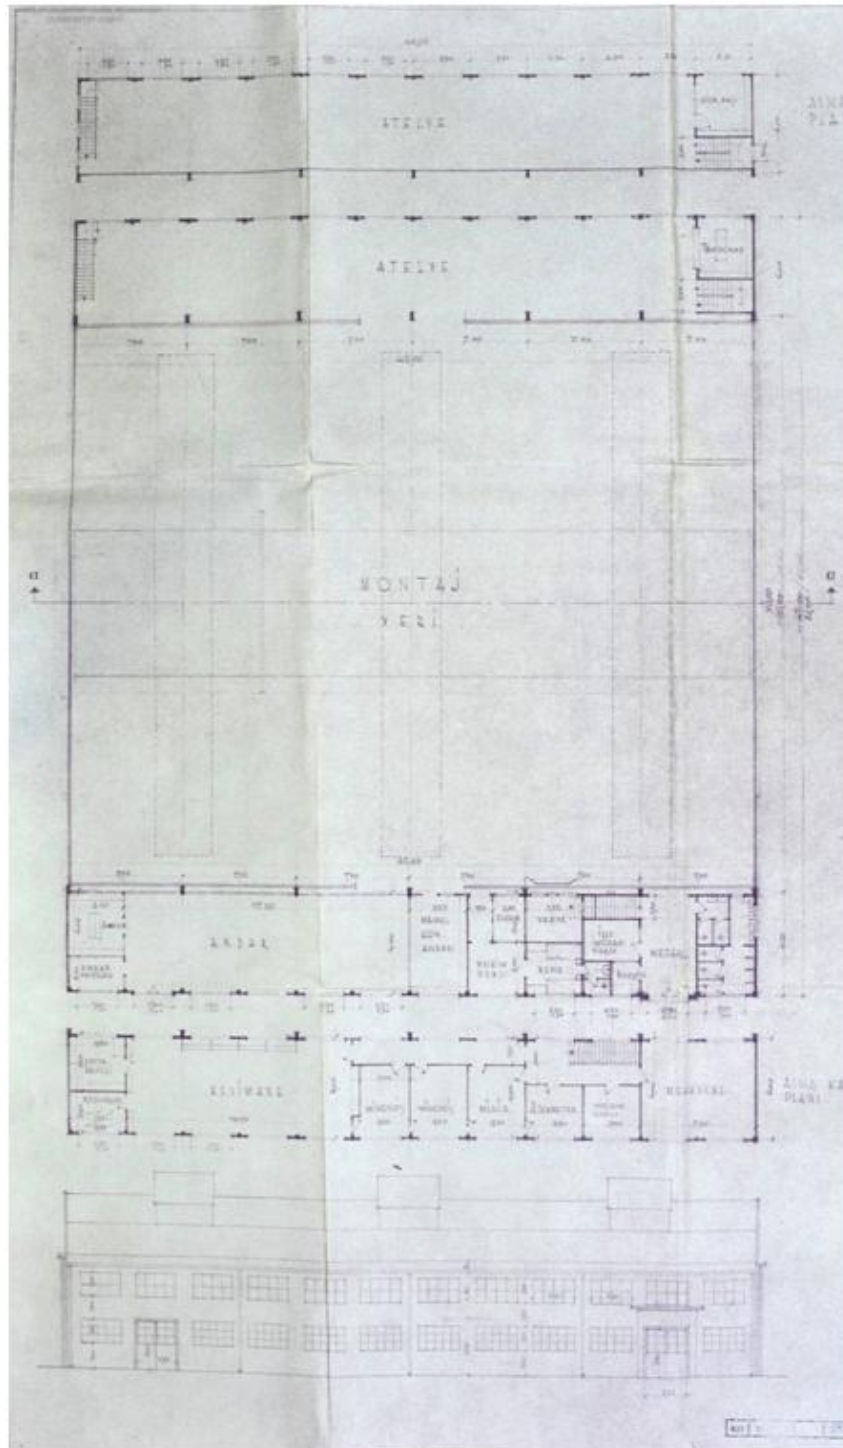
Aircraft Hangar ordered to Germany, plan drawing
